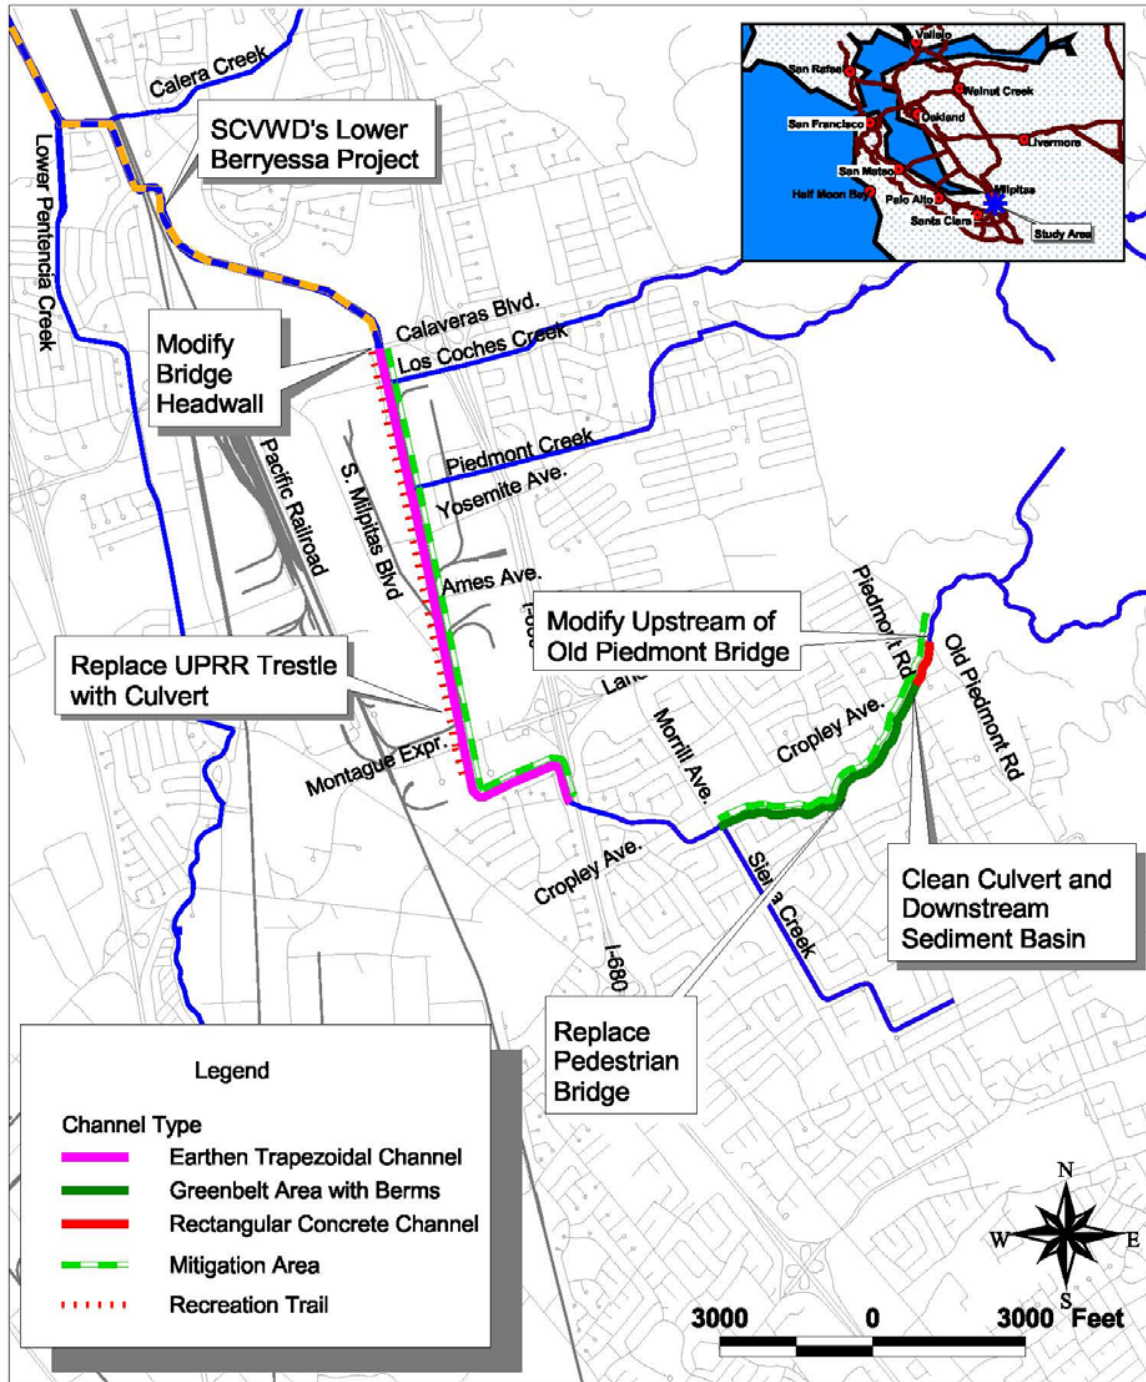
Alternative 2 – Earthen-Trapezoidal Channel with Mitigation (Old Piedmont Road to Calaveras Boulevard)
